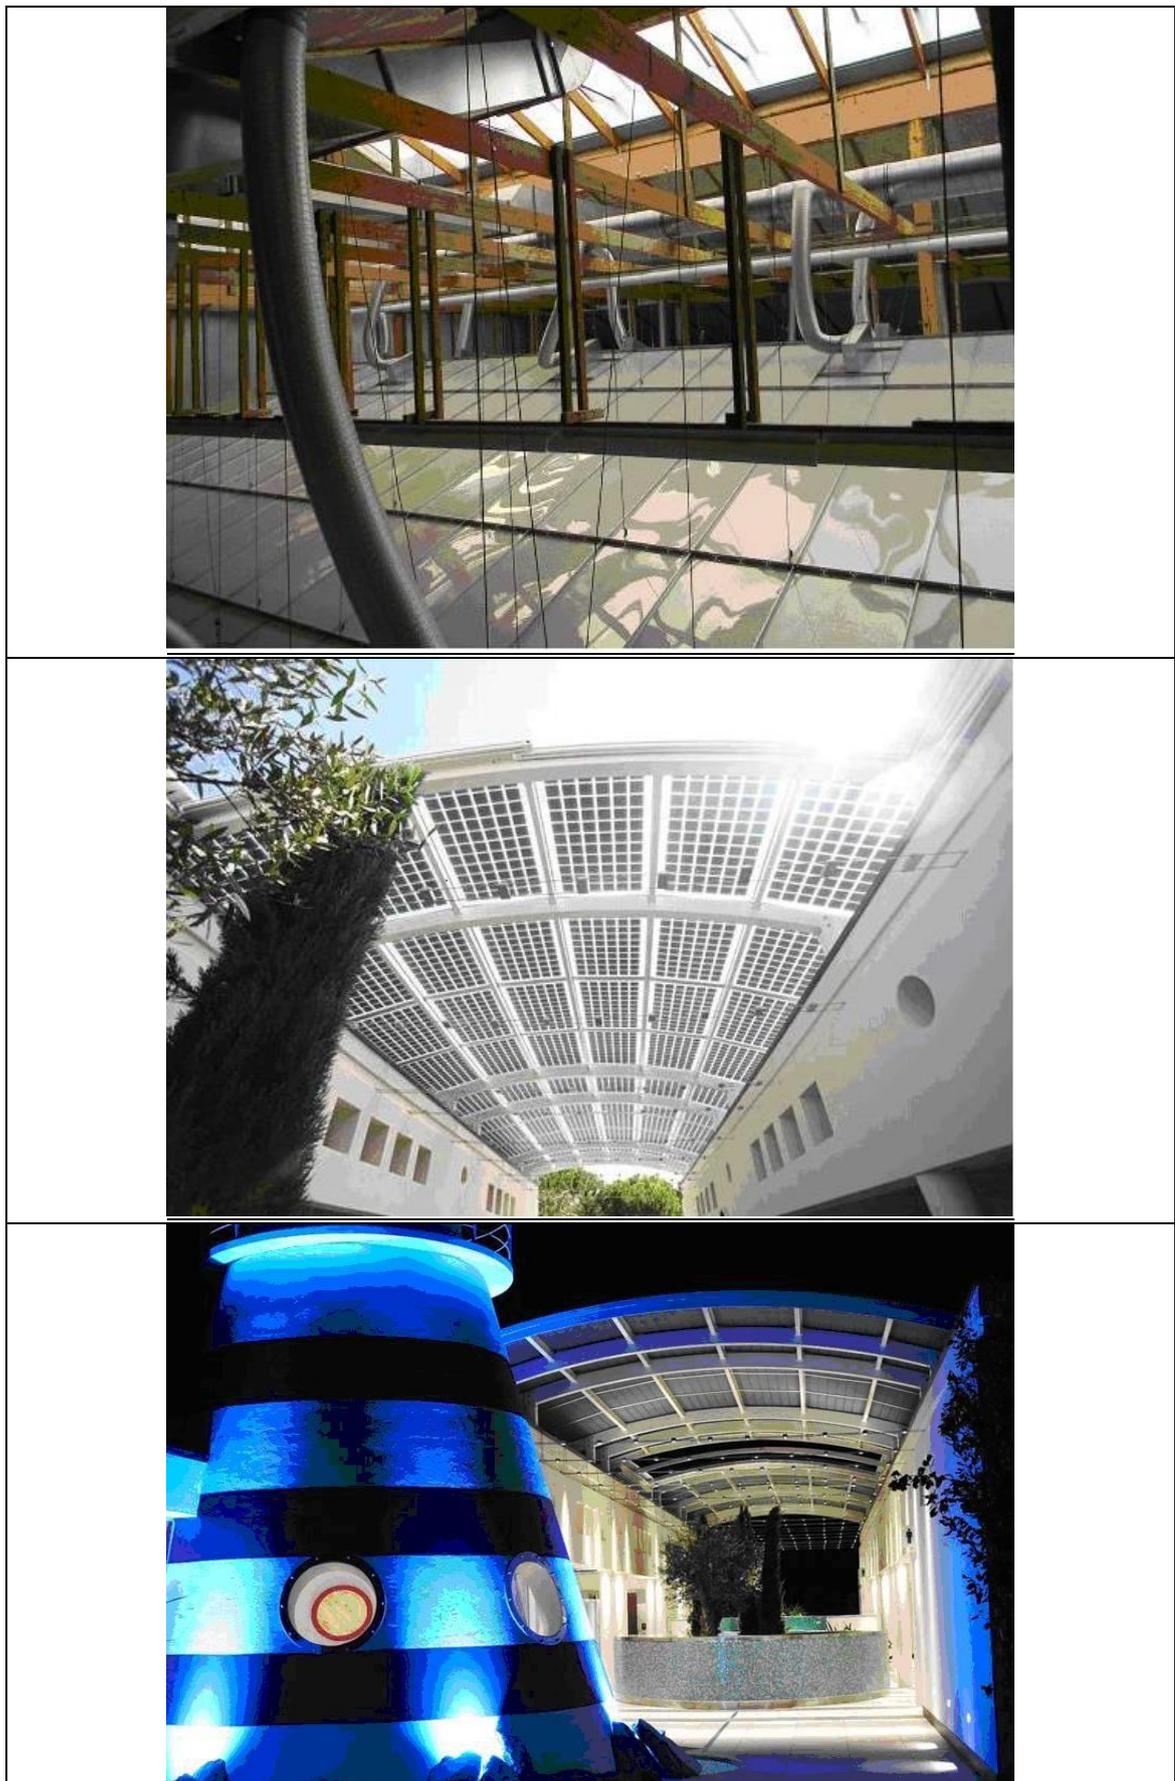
Window panels in the roof and suspended translucent ceiling allow natural light into the wash area of Kühlungsborn Campsite (above) and translucent retractable roof of the wash area in the Jesolo International Campsite (below)
